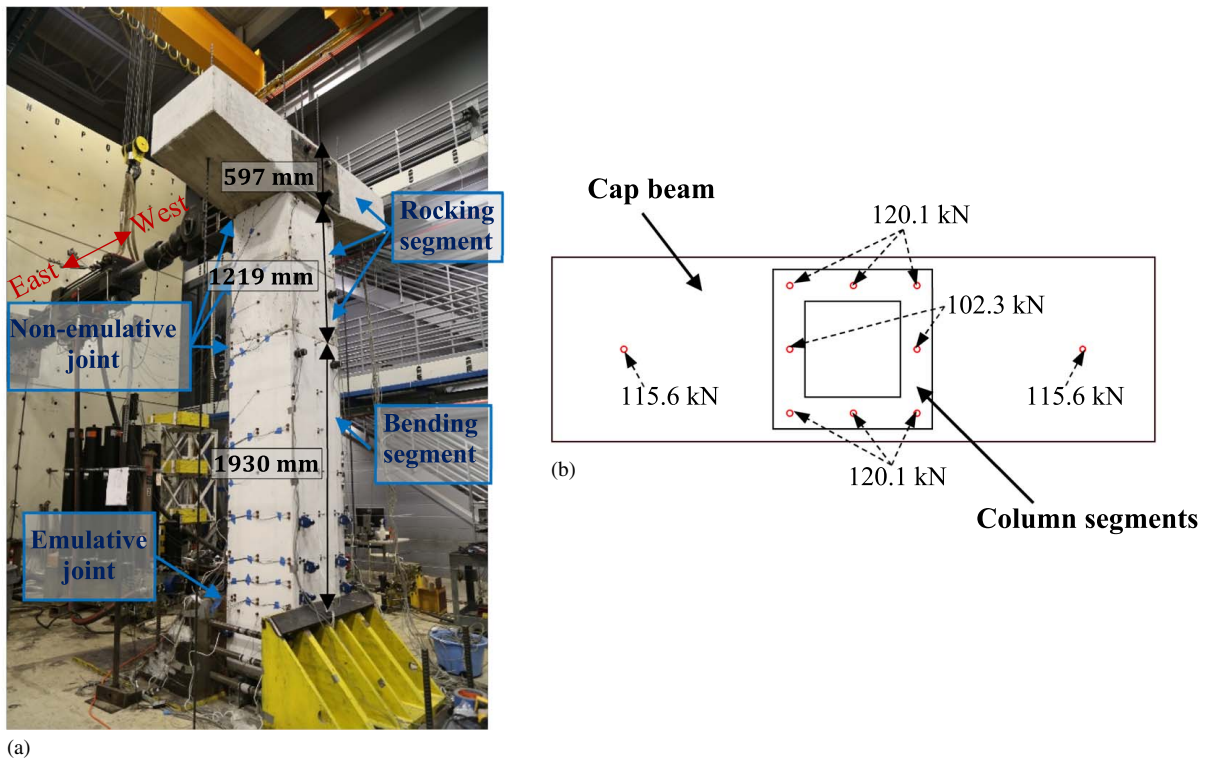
(a) Specimen and test setup; and (b) initial post-tension force shown on a plan view.
